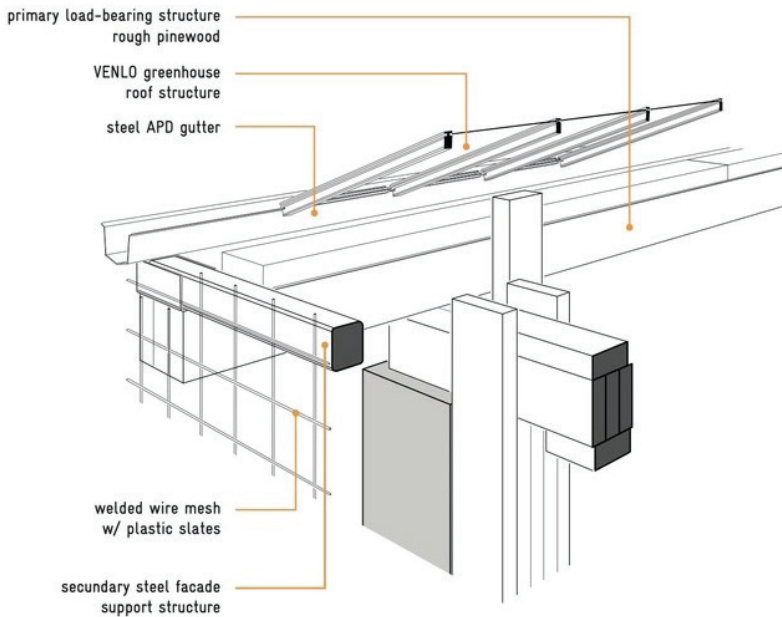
People's Pavillion, 2017 | Source: Archdaily
